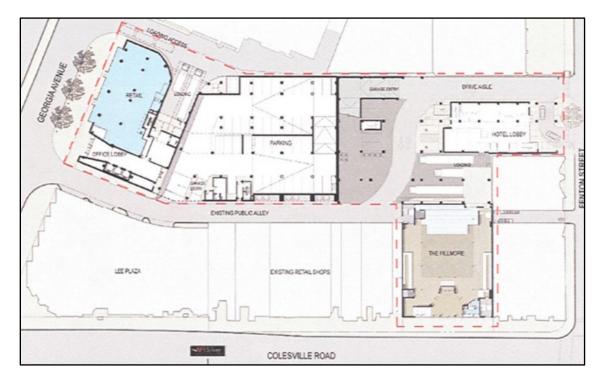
Illustrative rendering for Preliminary Plan No. 120100260 and Site Plan No. 820100100 MR2024011 and FCP No. 20240920, Garage 22
